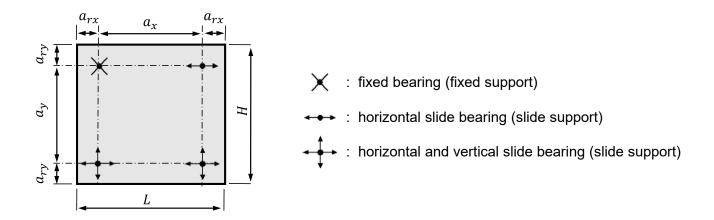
FAÇADE PANEL EDGE DISTANCES, SPACING AND SUPPORT CONDITIONS USING KEIL UNDERCUT ANCHORS KH
